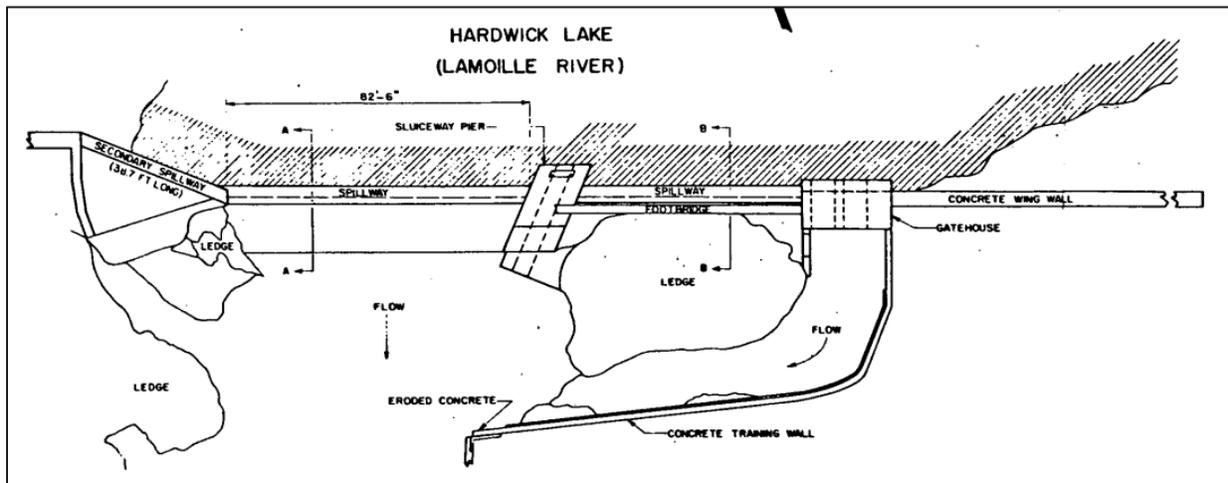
Jackson Dam plan adapted from reconstruction plans in 1952 and modified by field observations (USACE, 1980)
